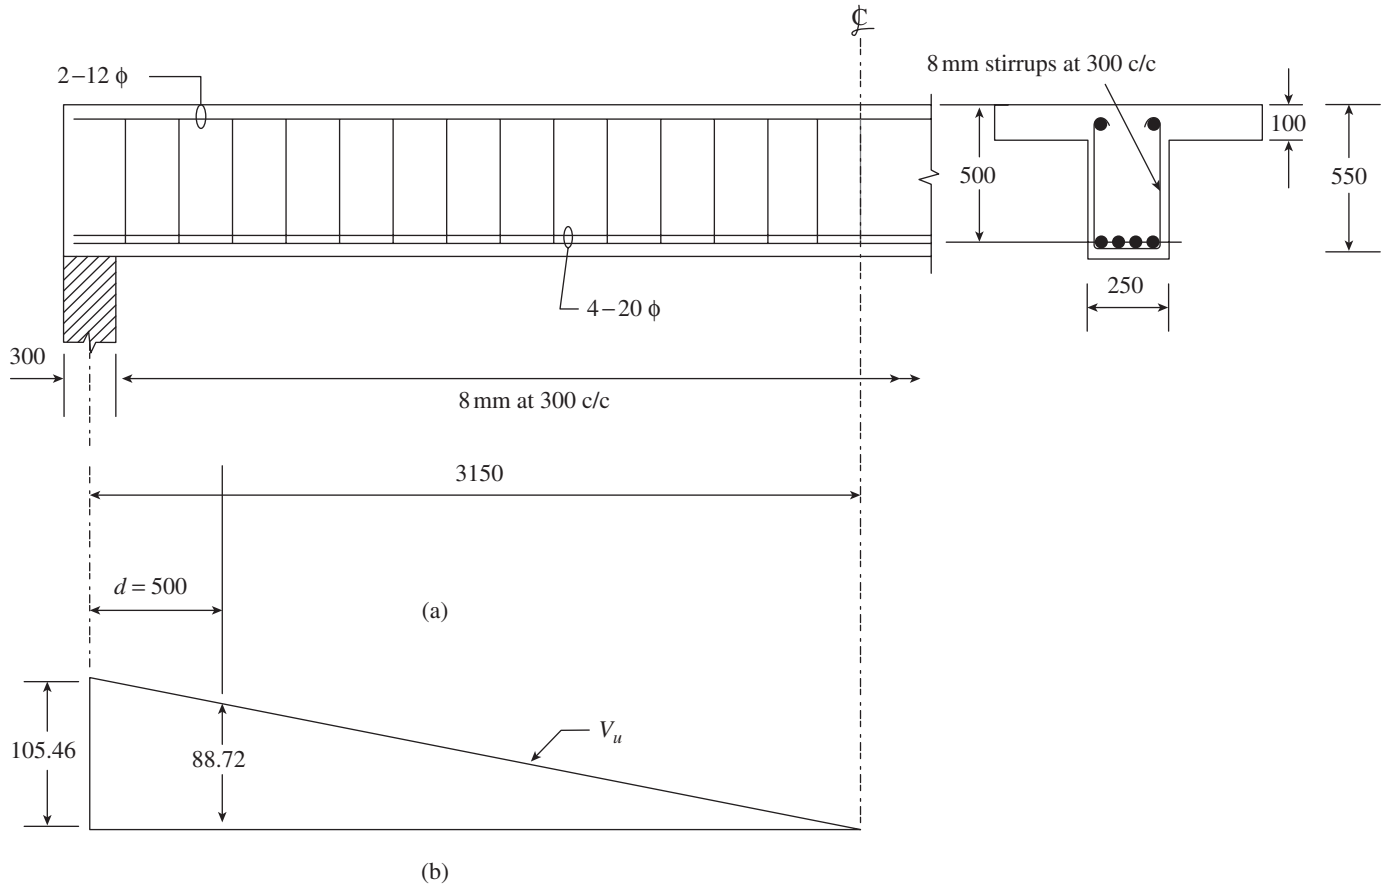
Beam of Example 6.3 (a) Shear reinforcement (b) Shear force diagram
